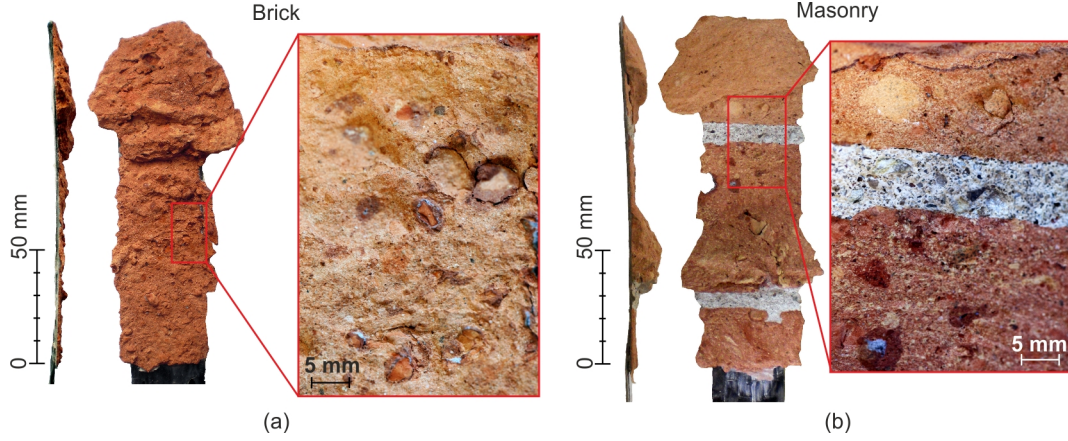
Type-1 failure observed for specimens built up with B-series bricks: (a) brick specimen B-2; (b) masonry specimen MB-3.
